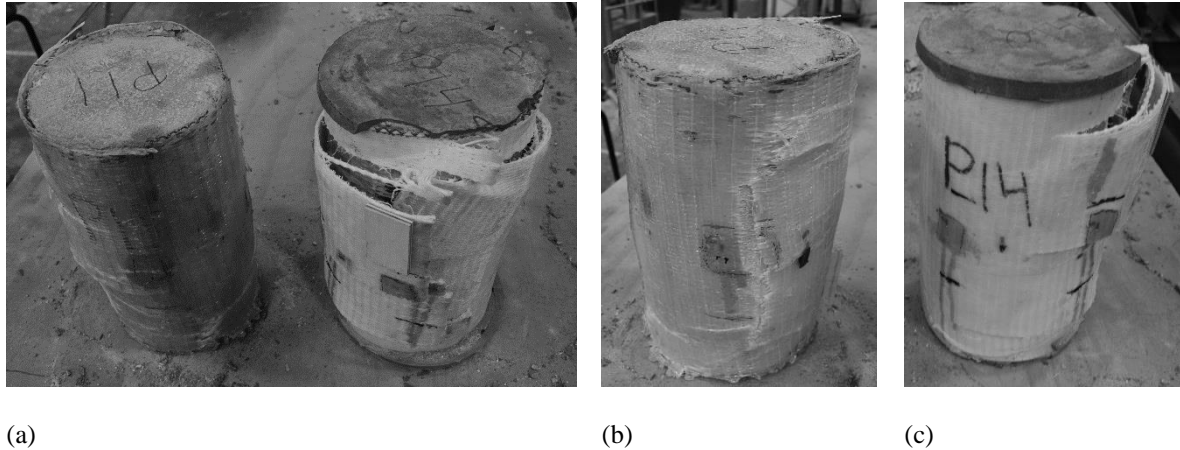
Failure mode of concrete filled LRS-FRP tubes (a) P11 and P14; (b) P11 (1PET-2GFRP (in/out)); (c) P14 (2GFRP-1PET (in/out)).
